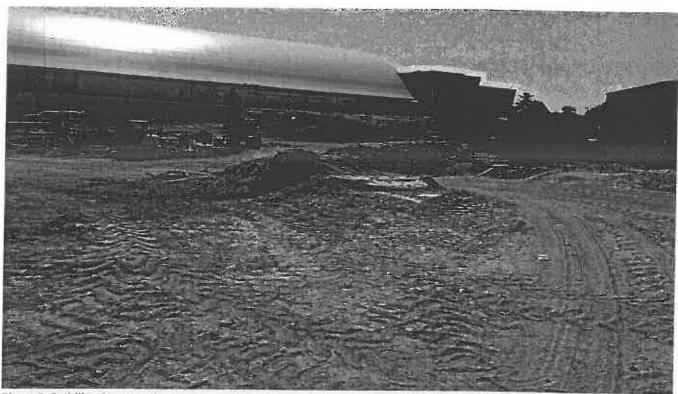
Stabilize Construction Entrance without aggregate stones tracking mud on paved road SW site of site.
